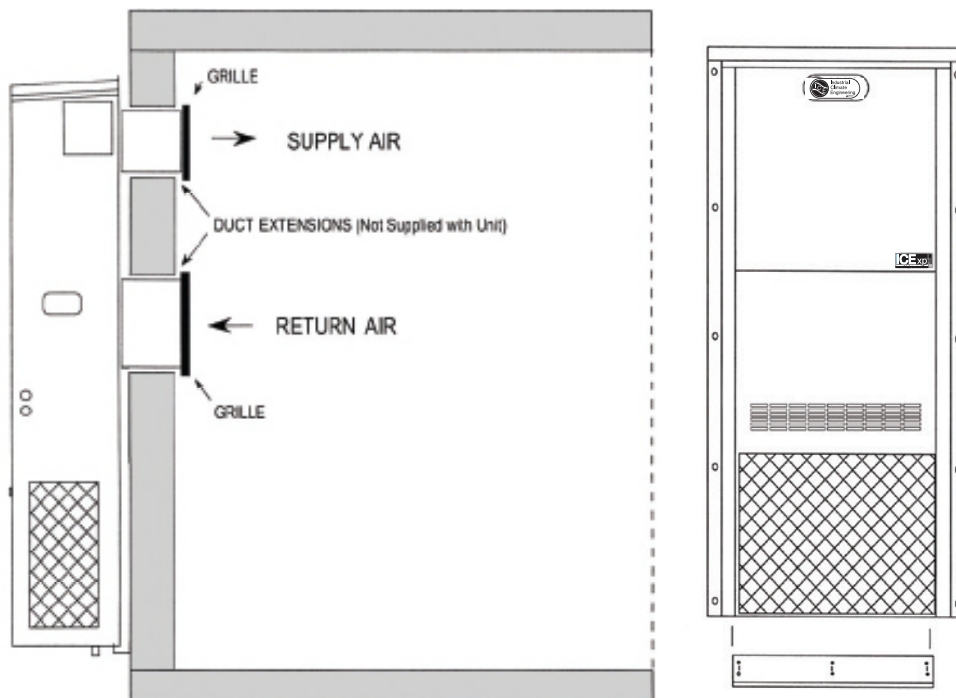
EXNA/EONA24/36/60/72 Air Conditioner Wall Mount Detail
